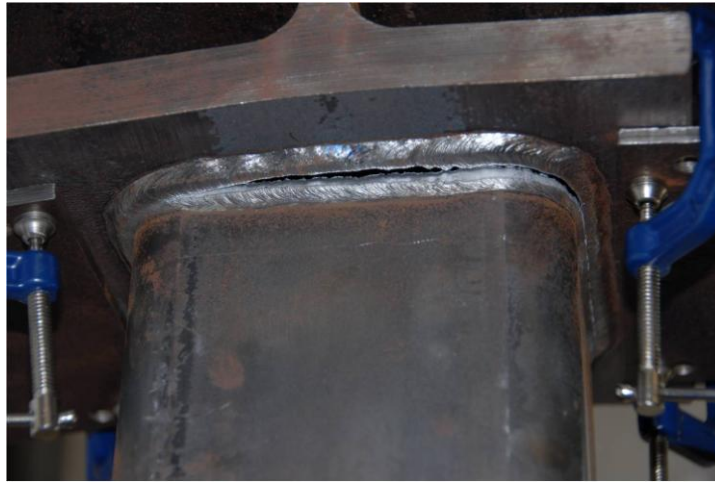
Fracture in Fillet Weld Connection
